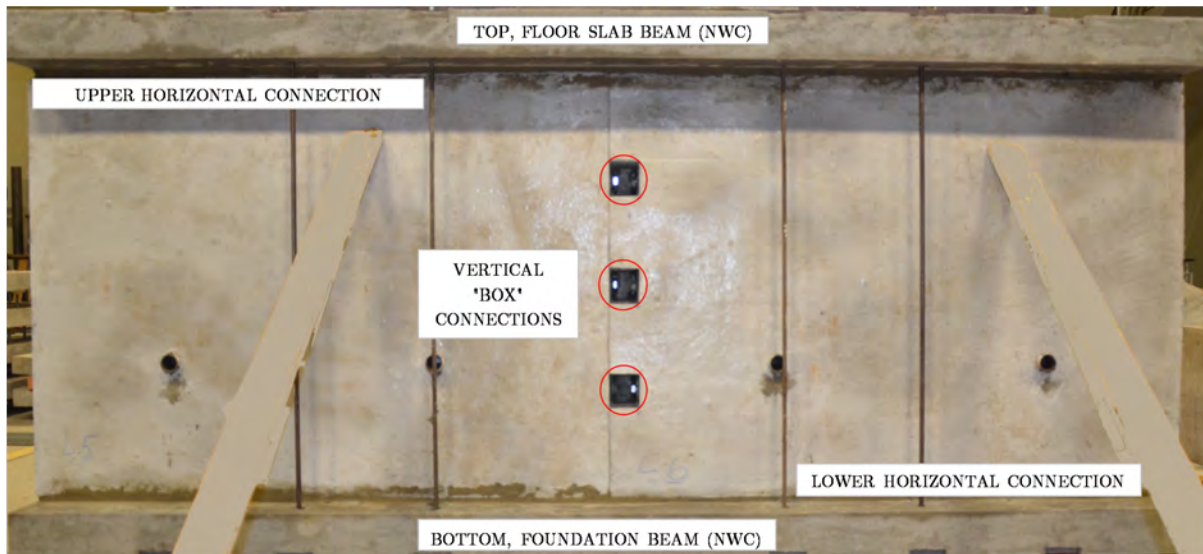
Assembled walls showing vertical "box" and horizontal "dowel" connections
